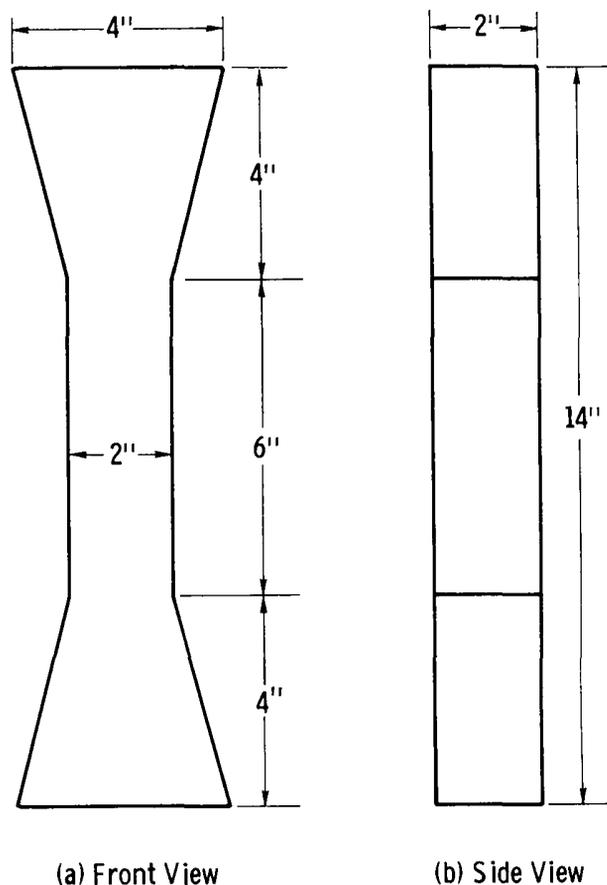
Test specimen (1 in. = 25.4 mm)
